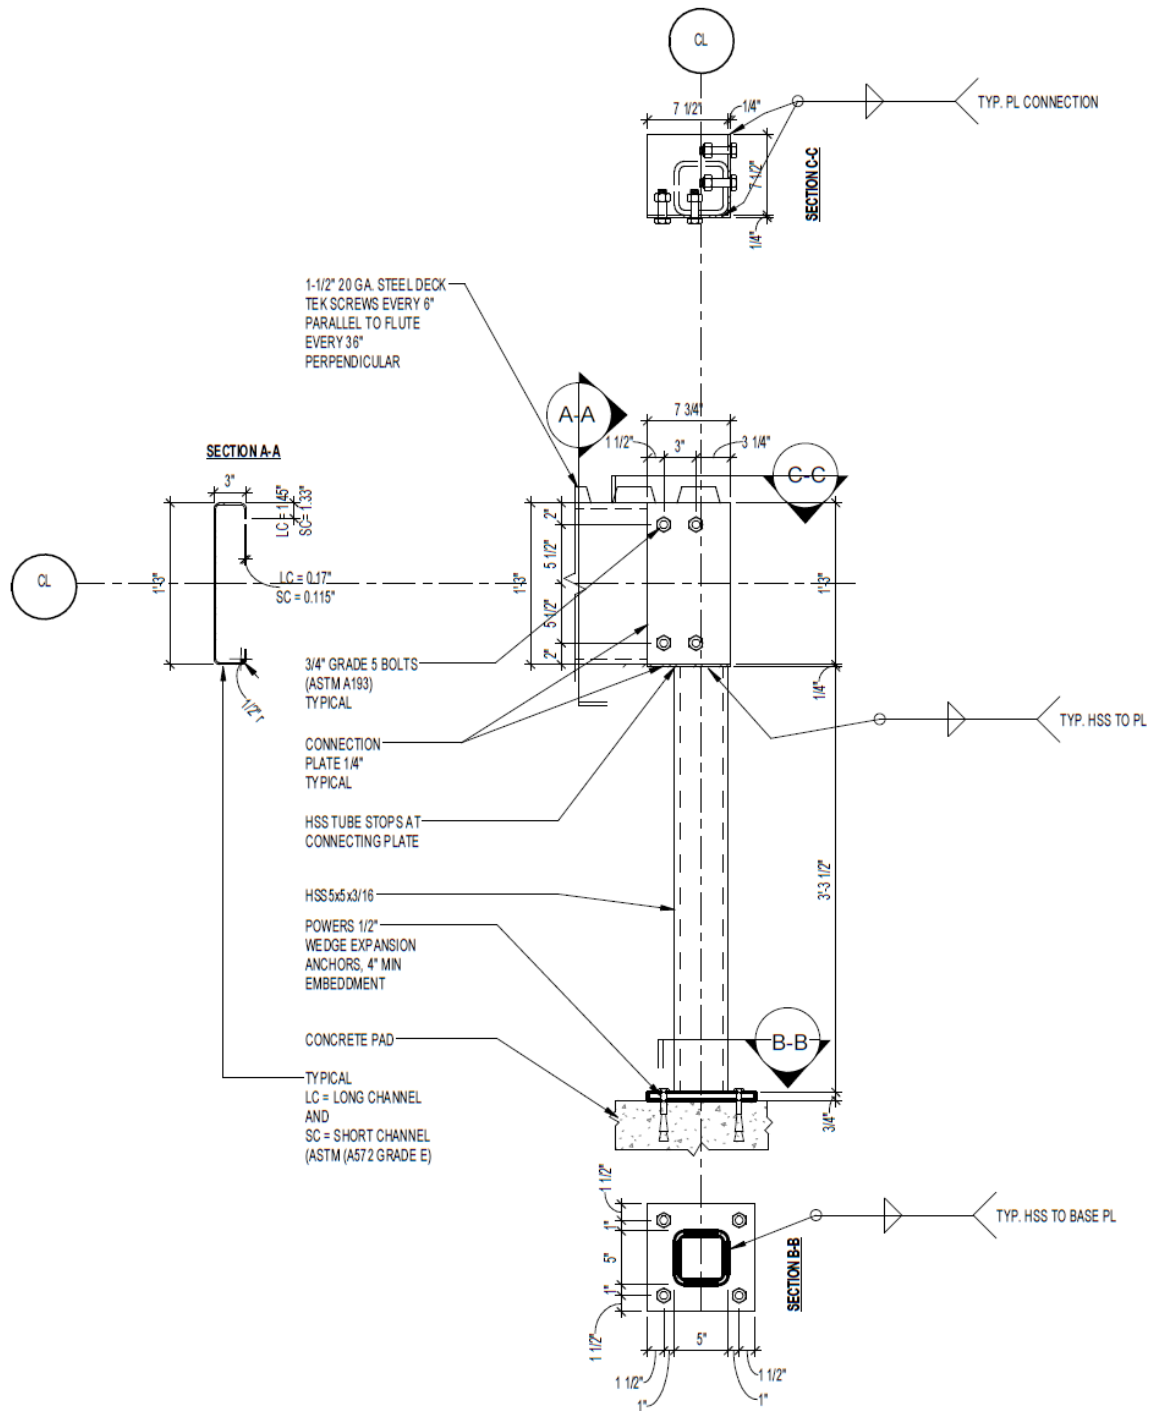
TYPICAL MEZZANINE END COLUMN (COLUMN C3NW)
